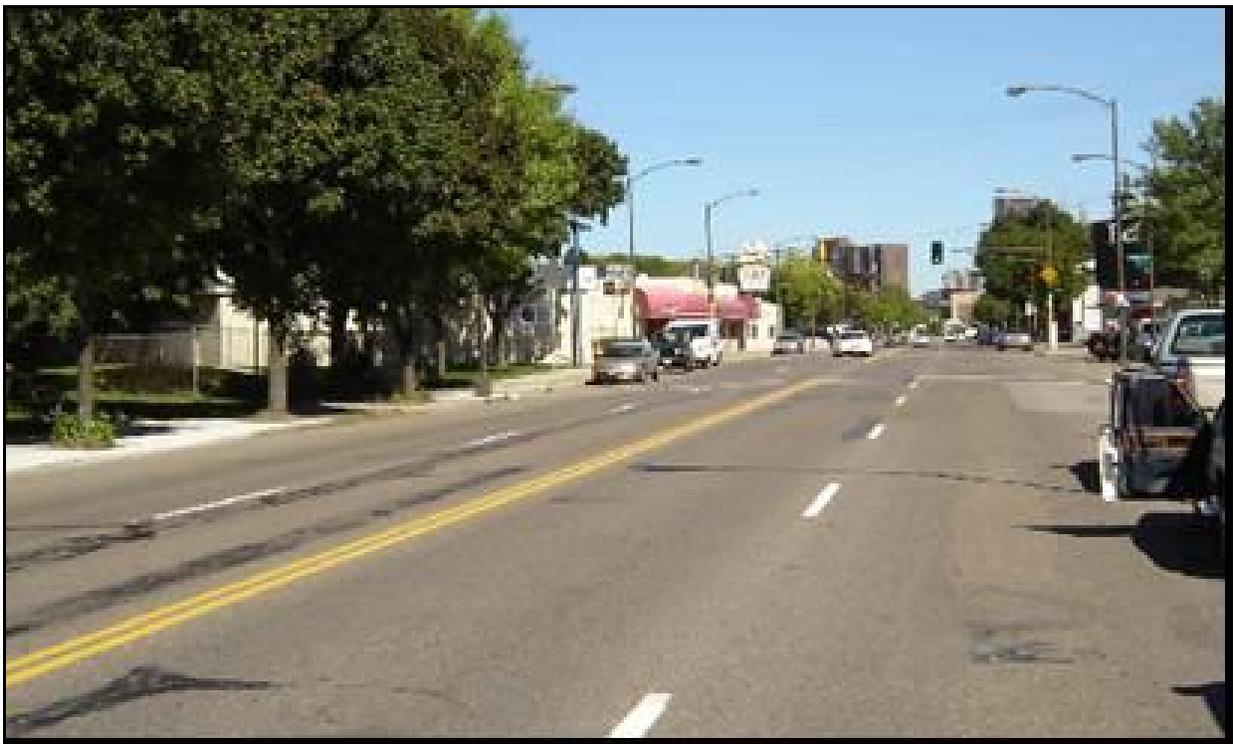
W. 7th Street towards Kellogg Boulevard
